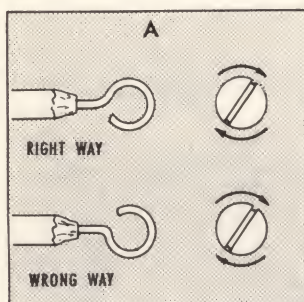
MAKING SCREW TERMINAL CONNECTIONS
